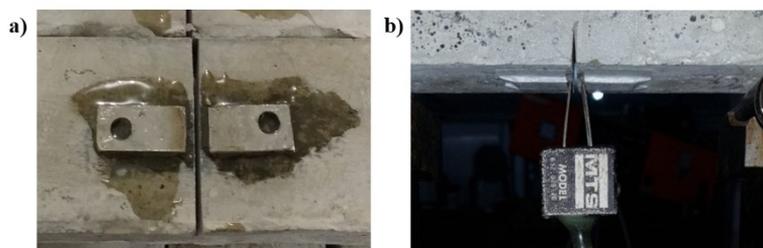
(a) Metal plates glued on the prismatic specimens; (b) extensometer placed on the prismatic specimens for three-point bending tests.
